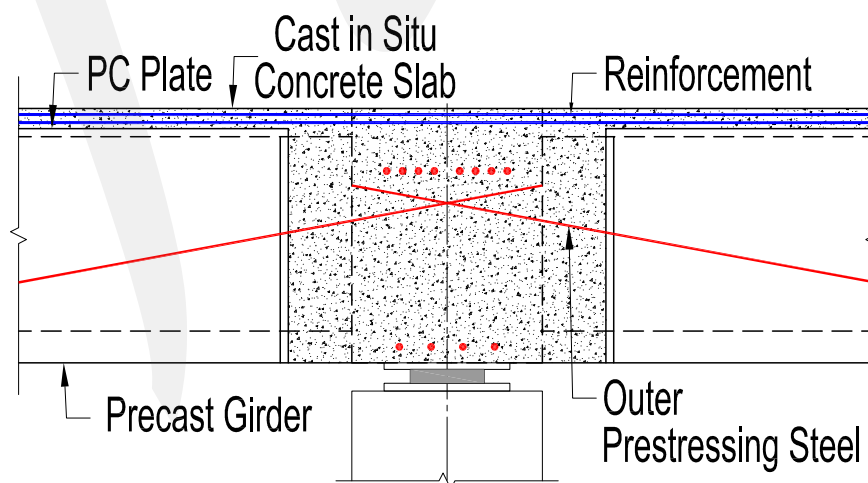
Pier beam, tendon anchorage and diaphragm detail over the pier.
